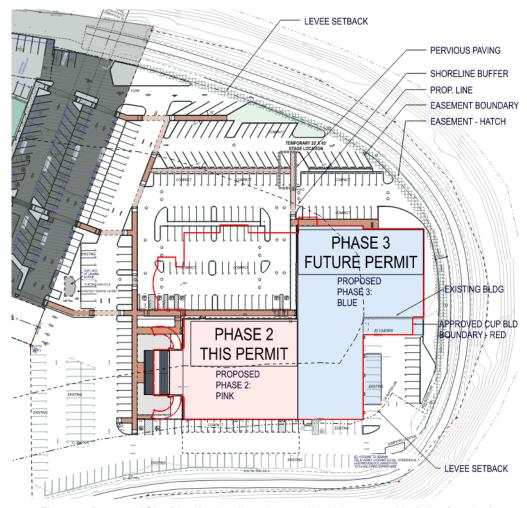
Proposed Site Plan (red outline shows originally approved building footprint)
